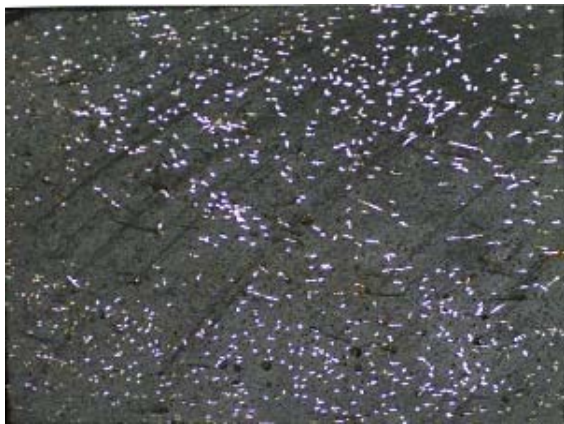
Vertical cut plane of steel fiber UHPFRC beam specimen
